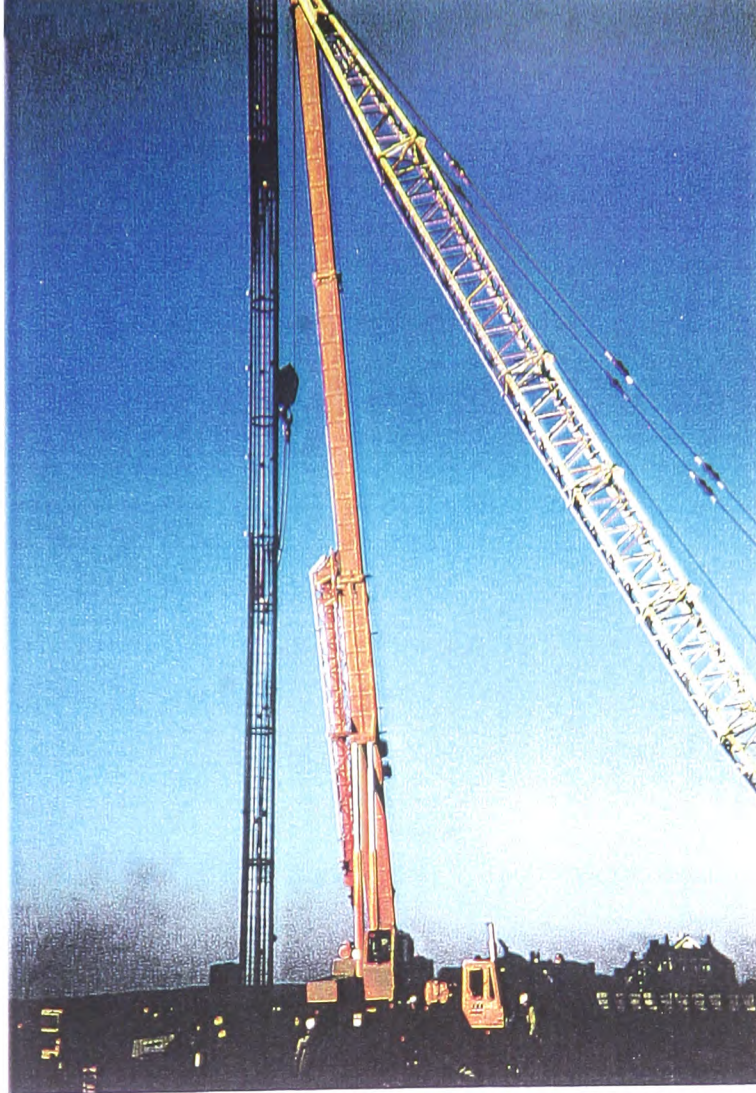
Lowering the full length of the reinforcement cage into the hole in order to avoid damage to the instrumentation and electrical connections
